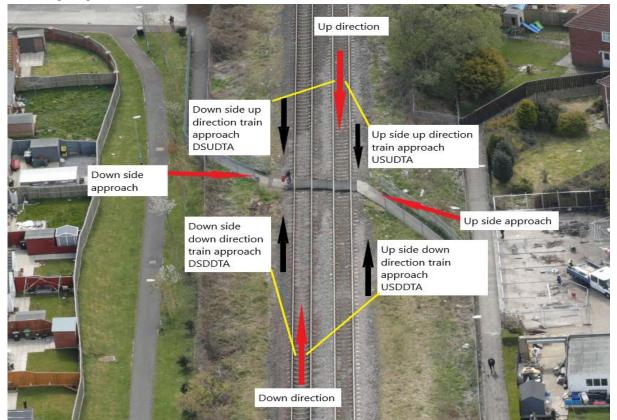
TYPICAL LAYOUT OF A LEVEL CROSSING
